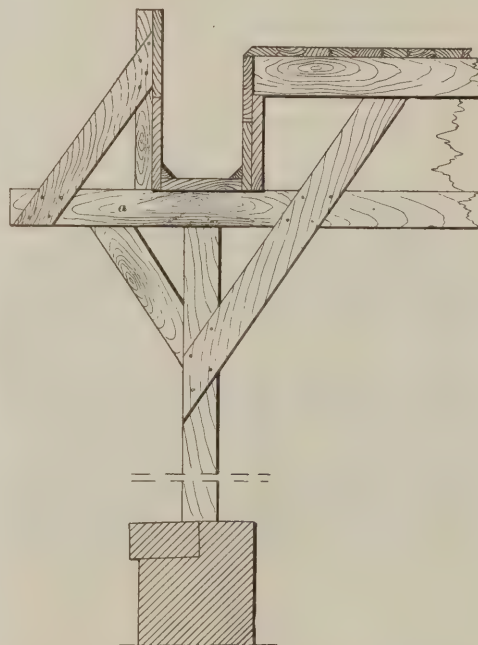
Arrangement of "Forms" When Lintels Do Not Extend Above the Floor.
